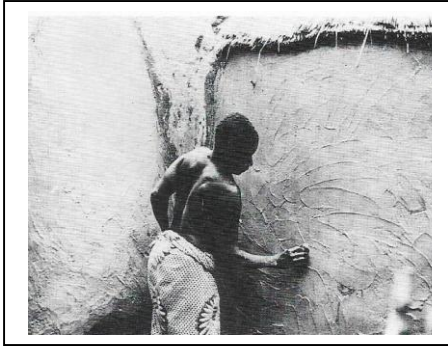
Final dressing of the walls Source: Schreckenbach, 1986
